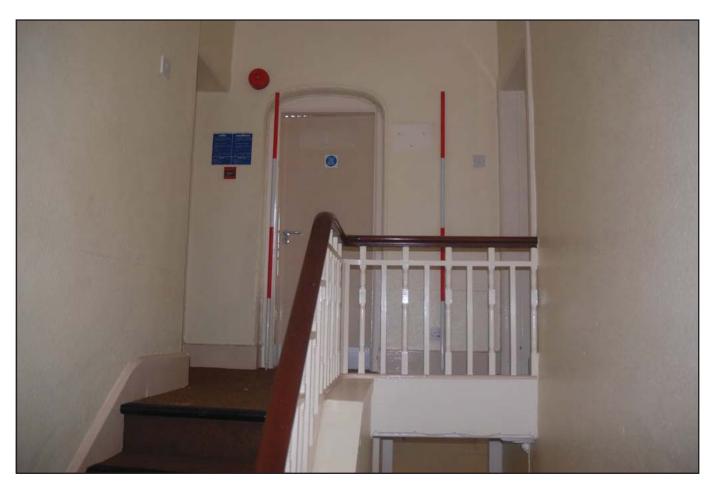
Administration Block (Internal): View northeast of first floor stairs leading to Rooms F02, F03 and F05. Room F03 is located at the centre of the image: the curved door arch is clearly visible. The staircase has a moulded rail with turned balusters; the tread and risers are carpeted.
